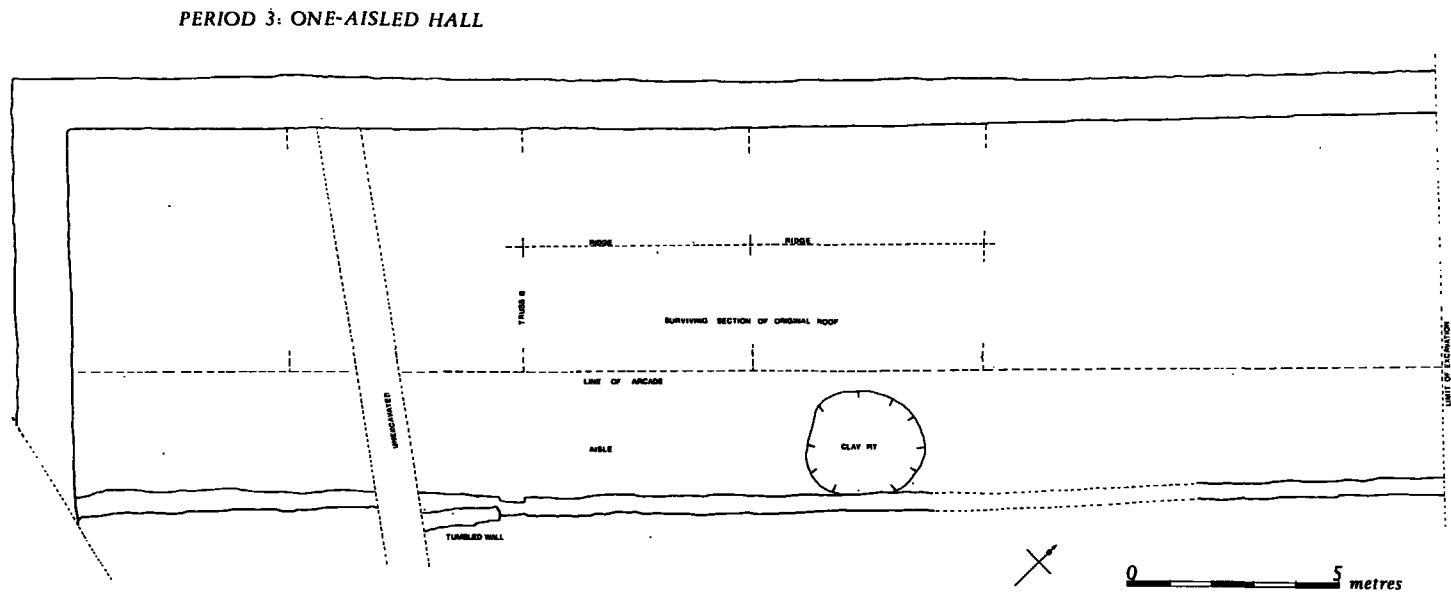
Bishops Waltham: Site 5, plan of the medieval one-aisled building in Period 3.
